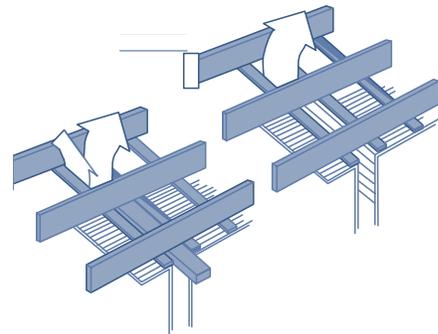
Depending on the way your house was framed, a lot of warm air can escape into the attic through the partition walls. Seal from the attic.
